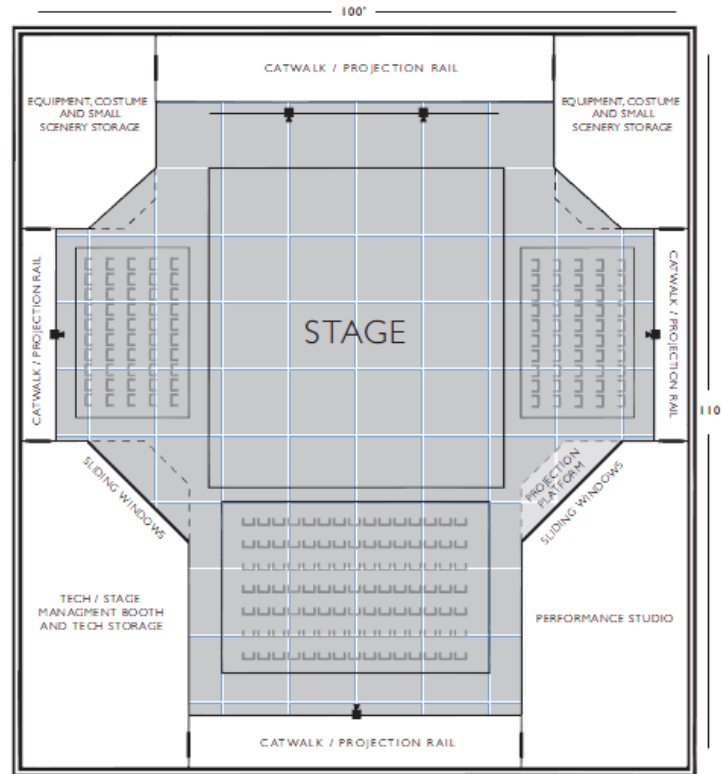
SECOND FLOOR PLAN OF DIORAMA THEATER ILLUSTRATING THE PROPOSED TECH CATWALKS AND DEACKS BY (KIRBY MALONE & GAIL SCOTT WHITE, 2006)
